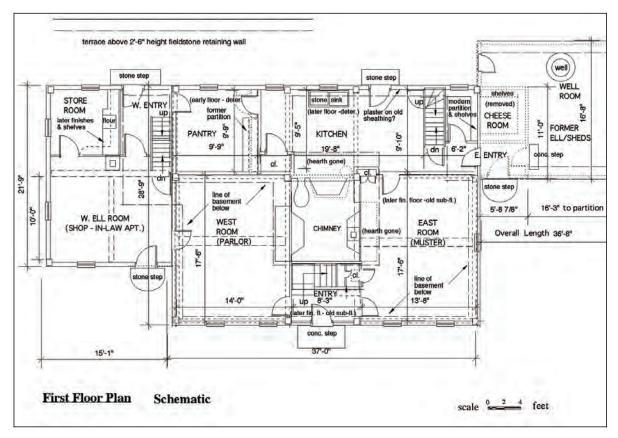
Architectural plan of the first floor of the Barrett Farm house including the no longer standing east ell (Detwiller 2007).
